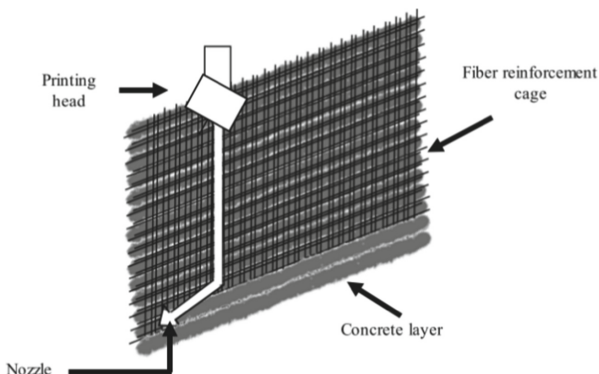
Proposal of textile reinforcement for 3DP concretes [12]
